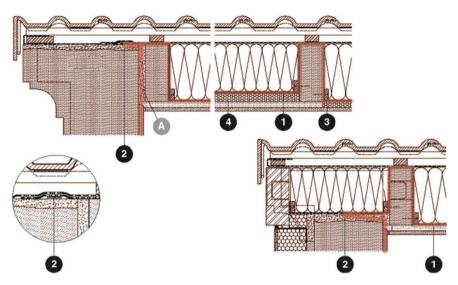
Verge – between-rafter insulation sub-top: (1) air barrier, (2) adhesive, (3) supporting lath, (4) protection layer (optional)
